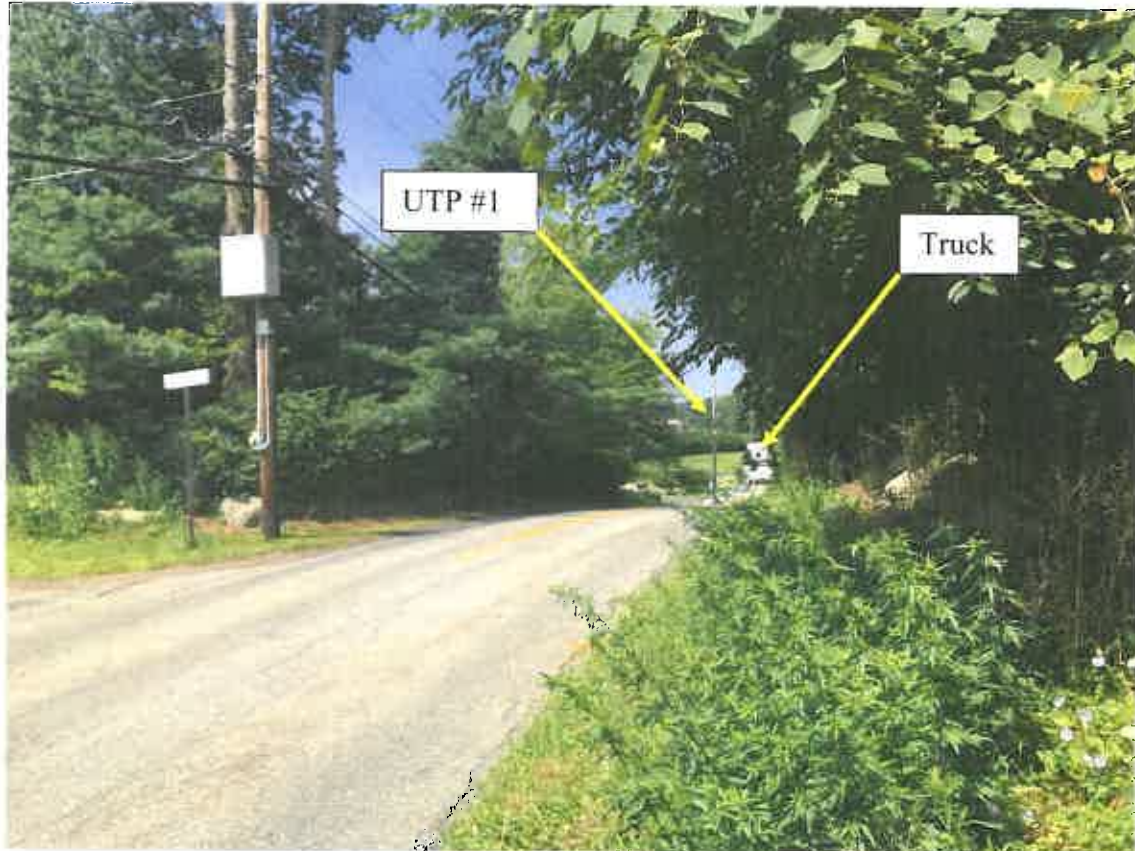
View from Proposed Driveway looking west on Bullet Hole Road
